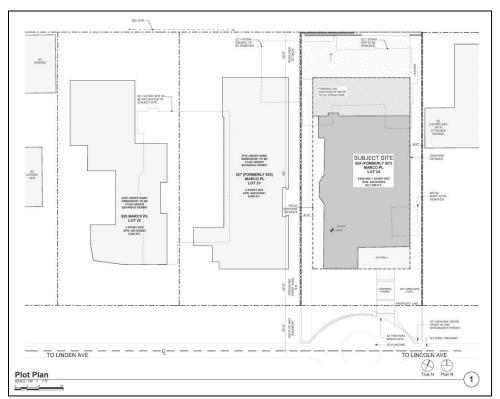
Site plan for Lots 22, 23, and 24, including relocation of contributing Bungalow
